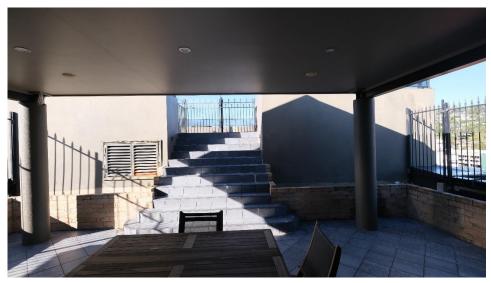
Rear terrace looking south towards the elevated swimming pool
